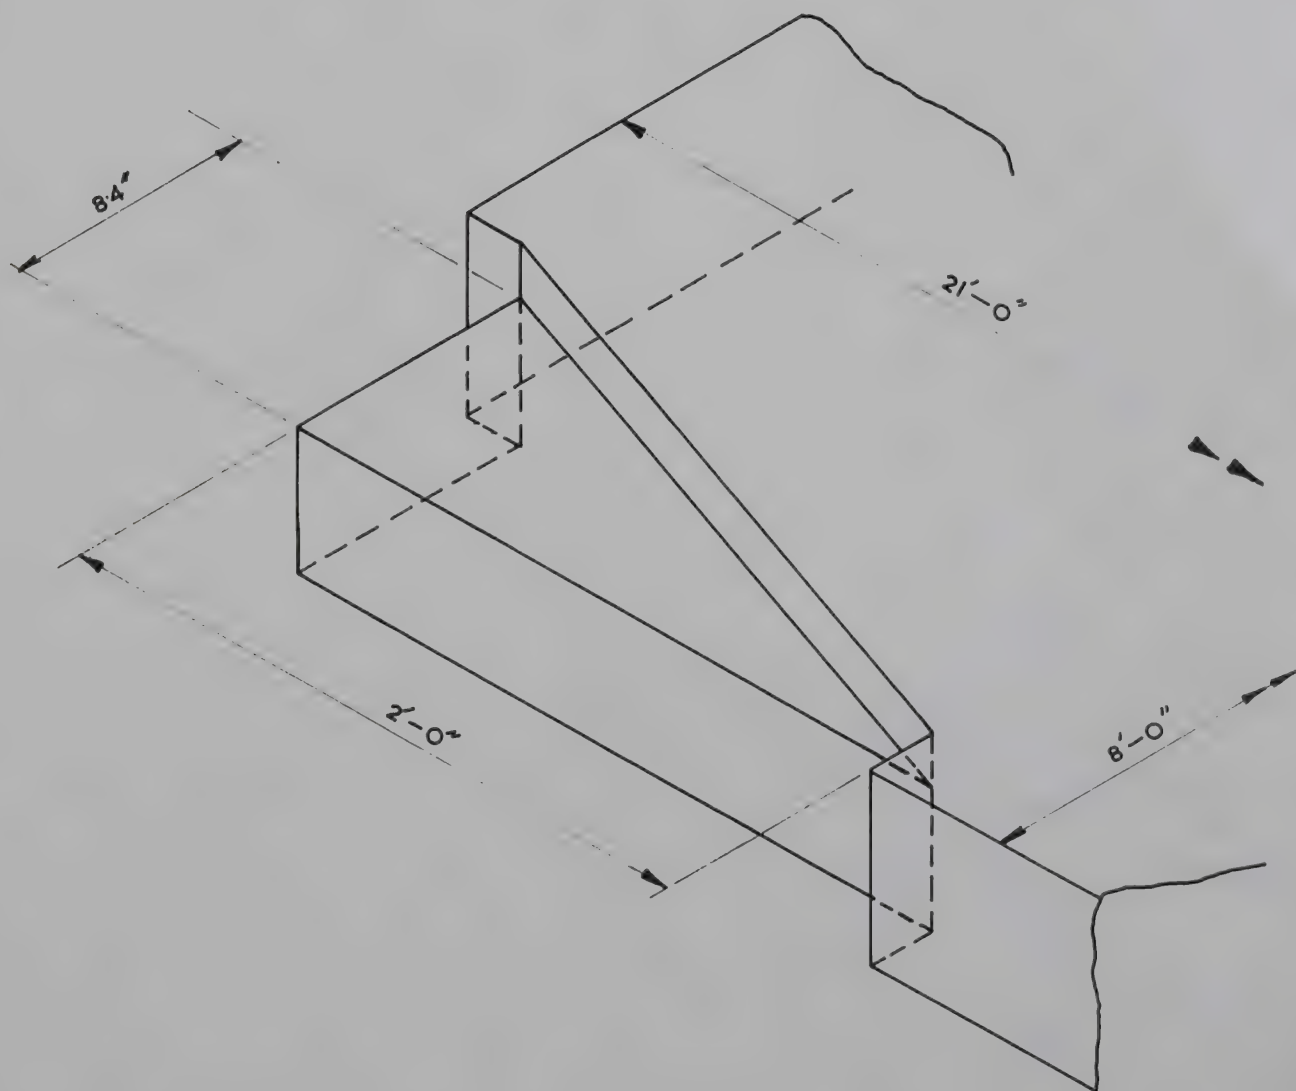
, CORNER DETAIL FULL SIZE SLAB.
